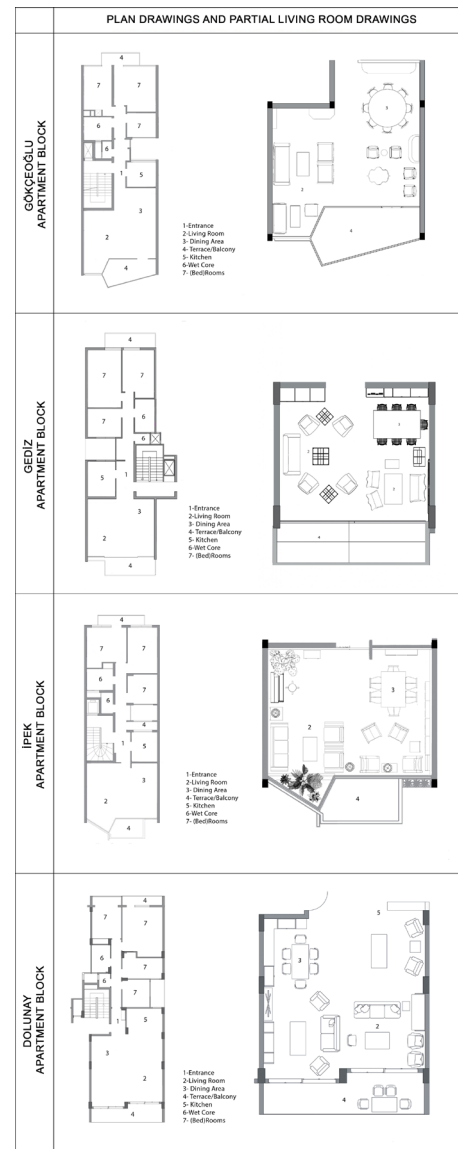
Plan drawings and partial living room drawings of case study apartment buildings. Prepared by the authors.
